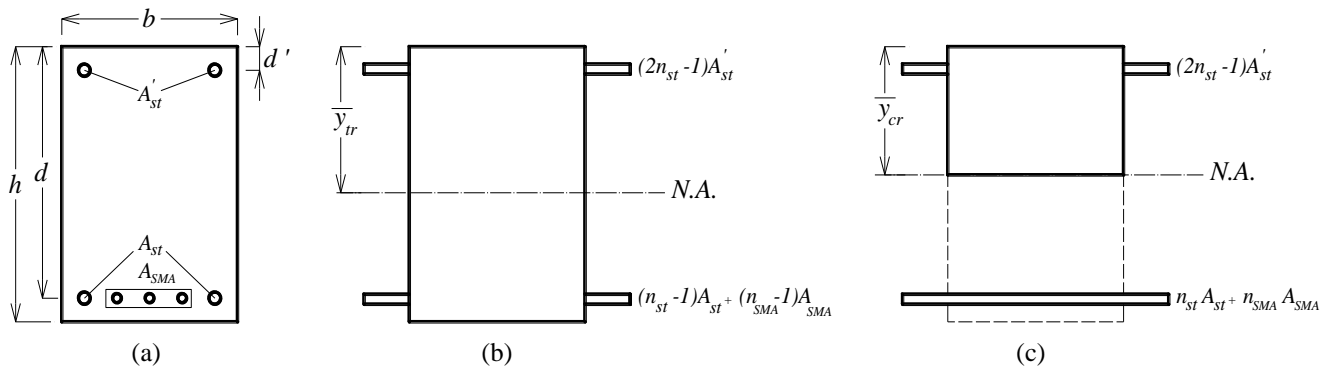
Cross section of strengthened beams: (a) typical section (b) transformed uncracked section (c) transformed cracked section
